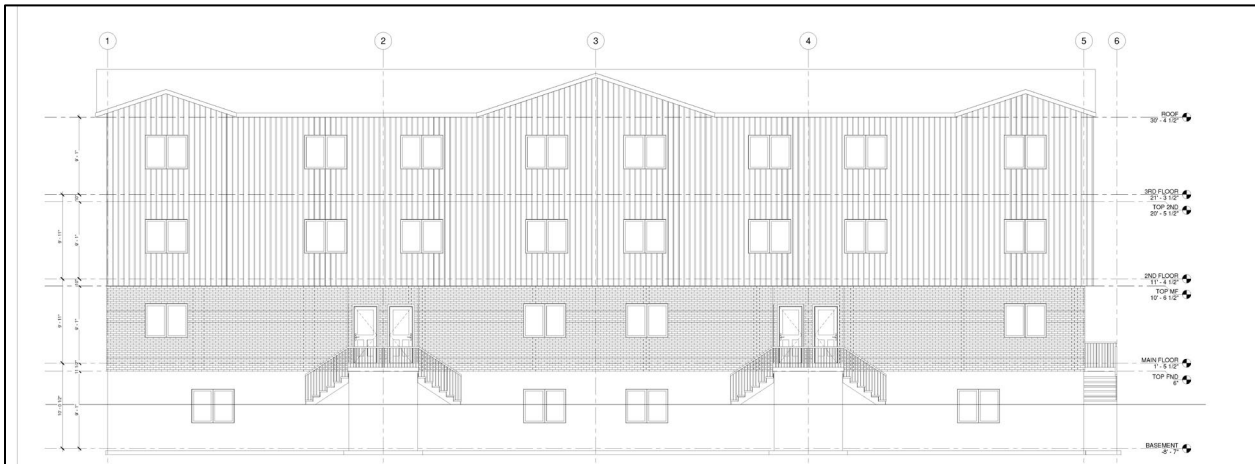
Proposed stacked townhouse elevations (looking east/south)
